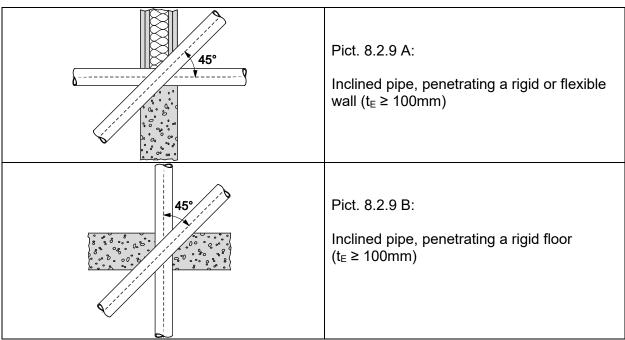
Inclined pipes in Design group 1, penetrating rigid walls / flexible walls and rigid floors
